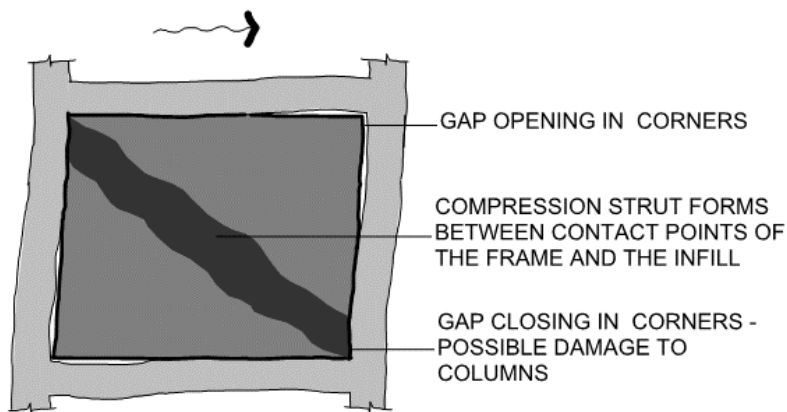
Illustration of compression strut forming between corners of frame due to interaction between frame and infill. Note that a column to column mechanism is shown.
